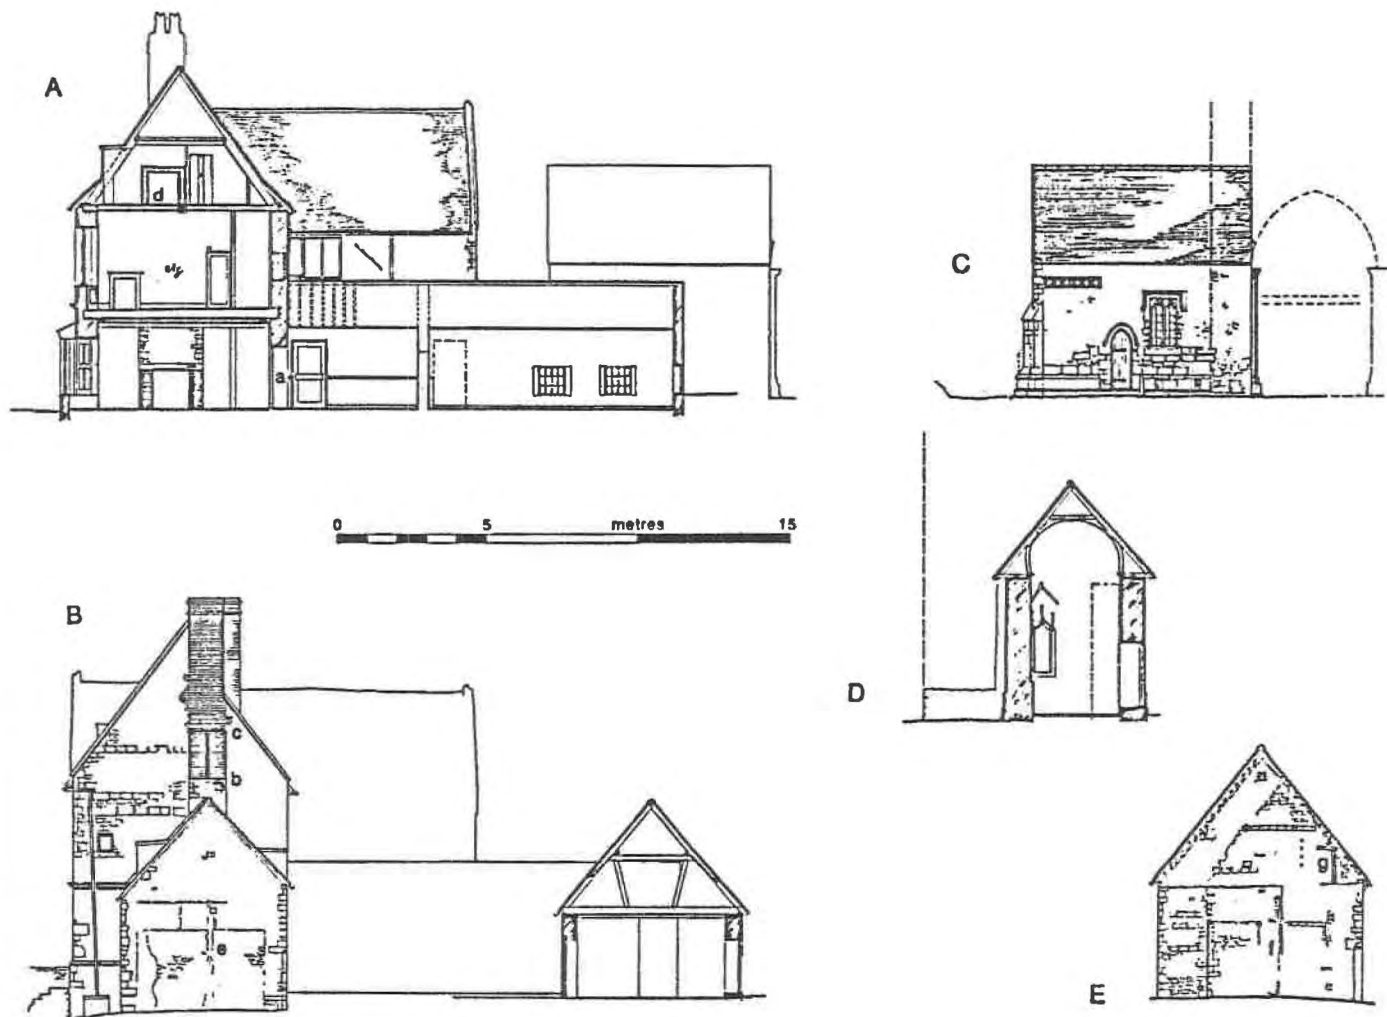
A: Section through the Farmhouse. B: The south elevation of the Farmhouse and a section through the Bakehouse. C: The south elevation of the Chapel. D: Section through the chapel facing east. E: The north elevation of the Stone Barn.
